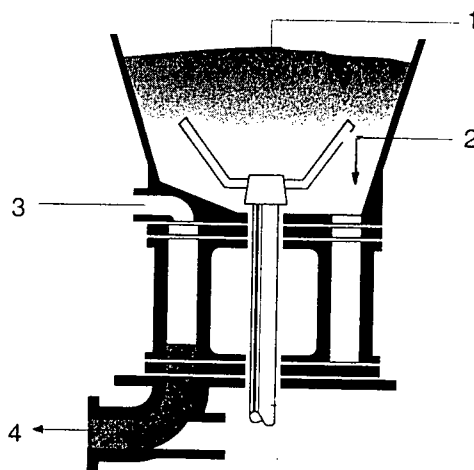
Schematic representation of the mechanism involved in a rotating barrel shotcrete machine (for a description of steps 1 to 4 refer to the text).
